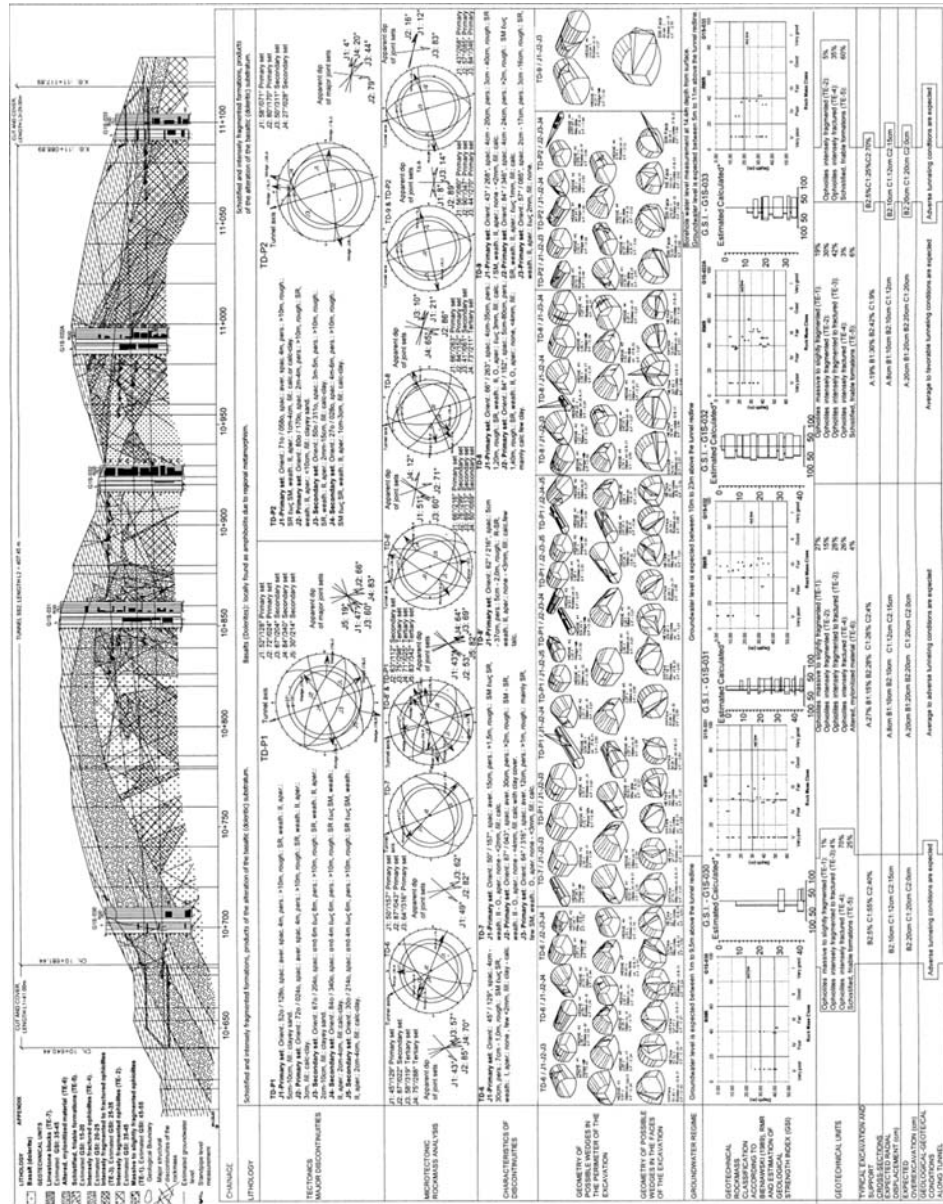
Geological – Geotechnical longitudinal section of SS2 tunnel
